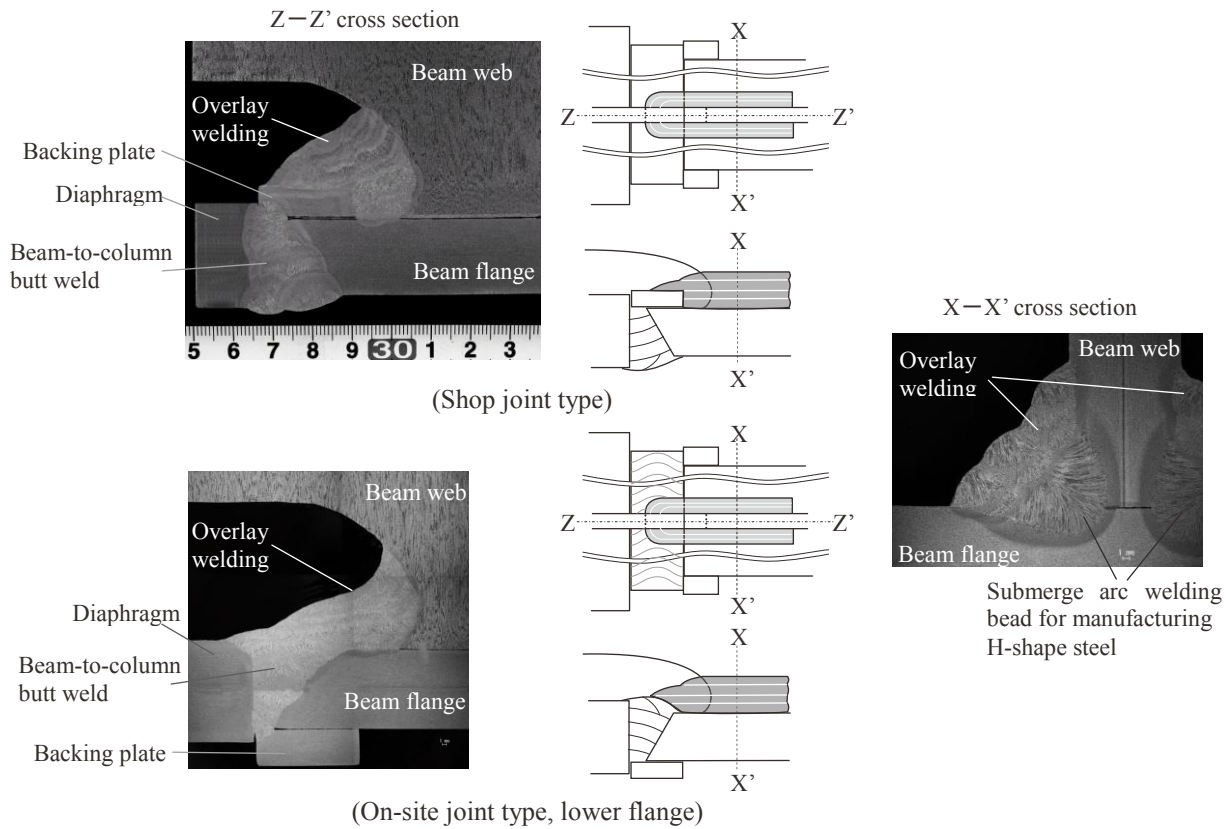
Cross section of the overlay welding around toes of scallops of lower flange side
